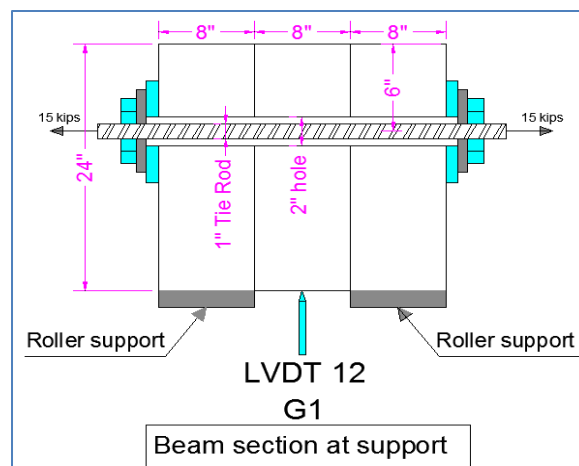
Typical Cross-Section of Beam Assembly at Supports
